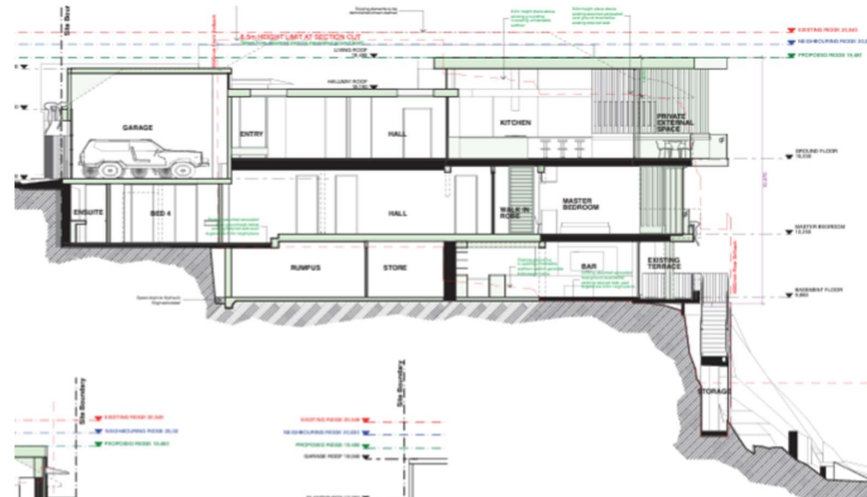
Extract of Section A of development approved pursuant to DA2023/0202 at 26 Greycliffe Street
